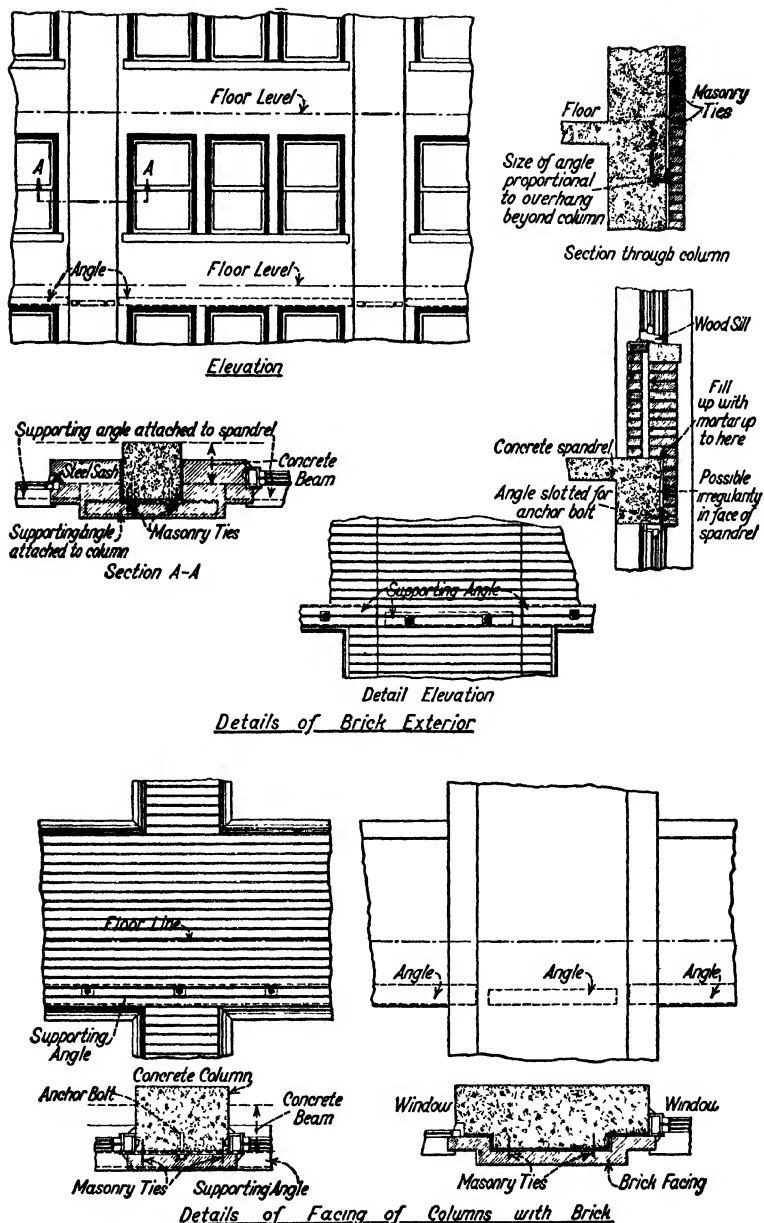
Partial Elevation and Sections of Brick Veneer Building.
